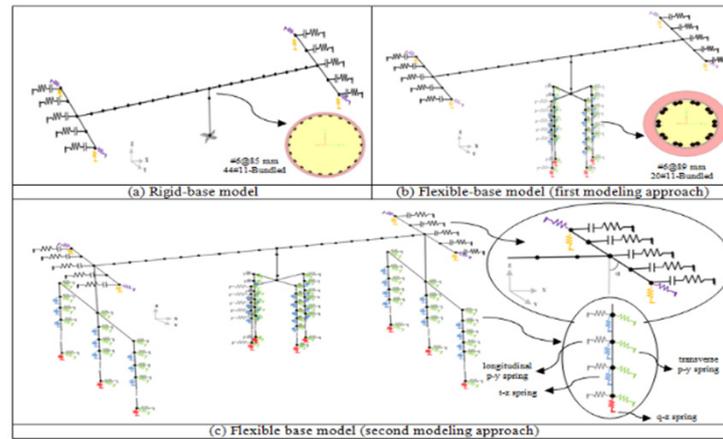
3D analytical finite element modeling scheme of the specimen bridge
